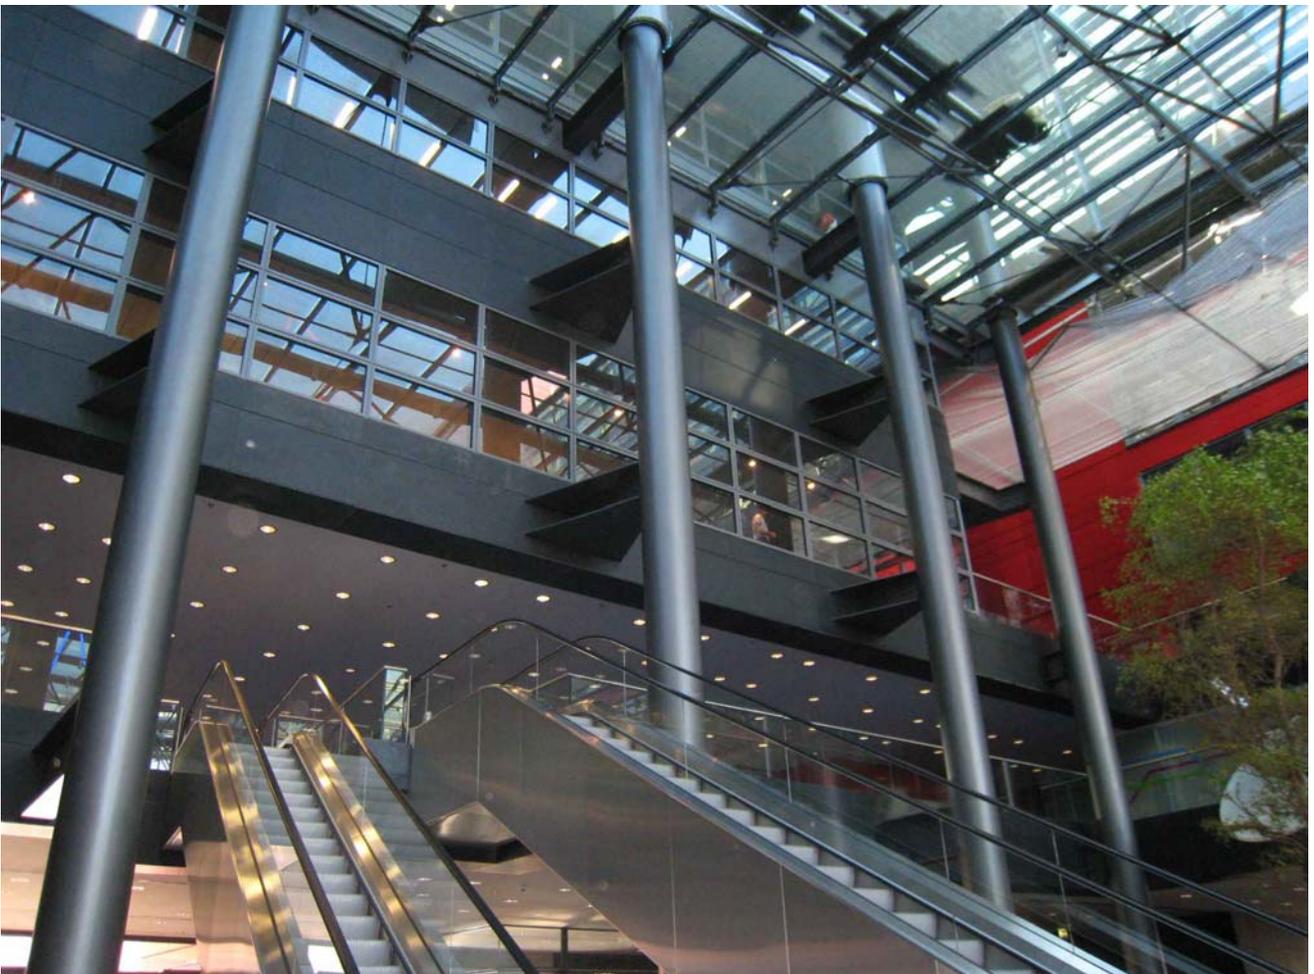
Slender composite columns climbing in the atrium over a height of 20 m, composed of steel tube, internal H-section, spiral wire and concrete; no reinforcing bars were used. The columns are completely visible and are not covered by any fire protection material
